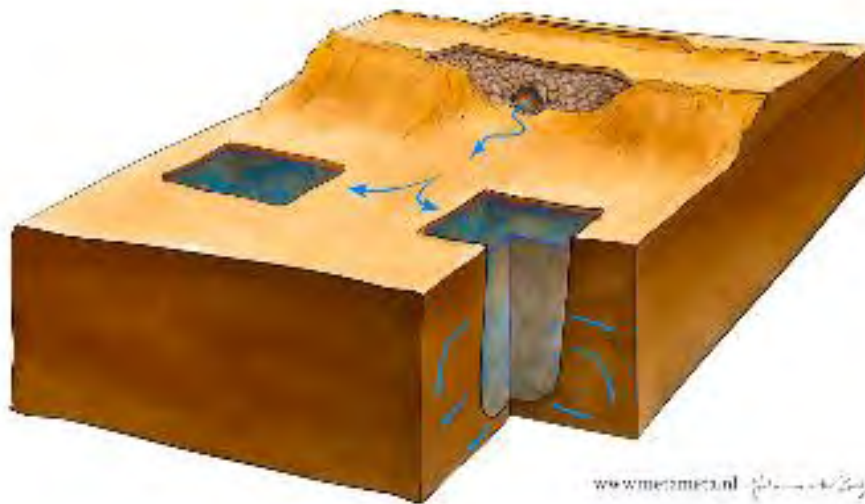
Road side runoff diverted into ponds for surface water storage and groundwater recharge.
